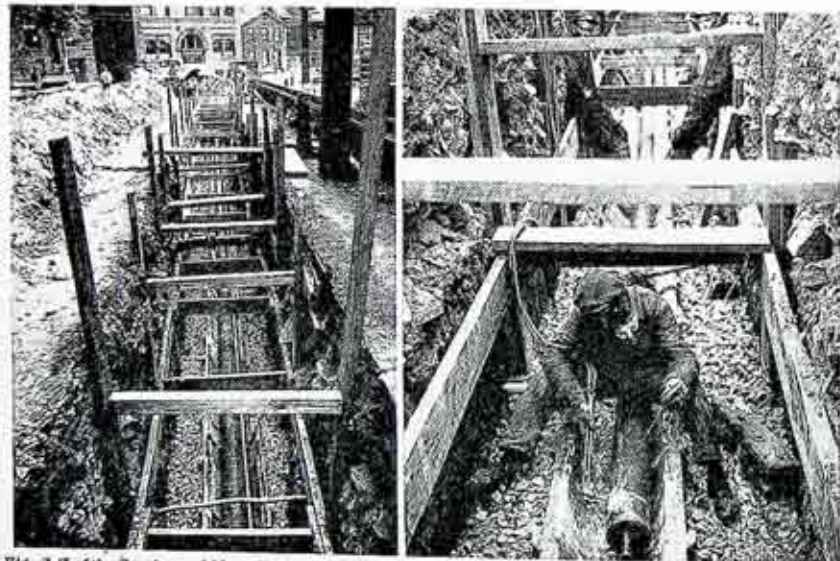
(Left), Section of New Type Construction through Rau Place; Fig. 3 (Right), Electrically Welding a Main End before the Hydrostatic Test.
